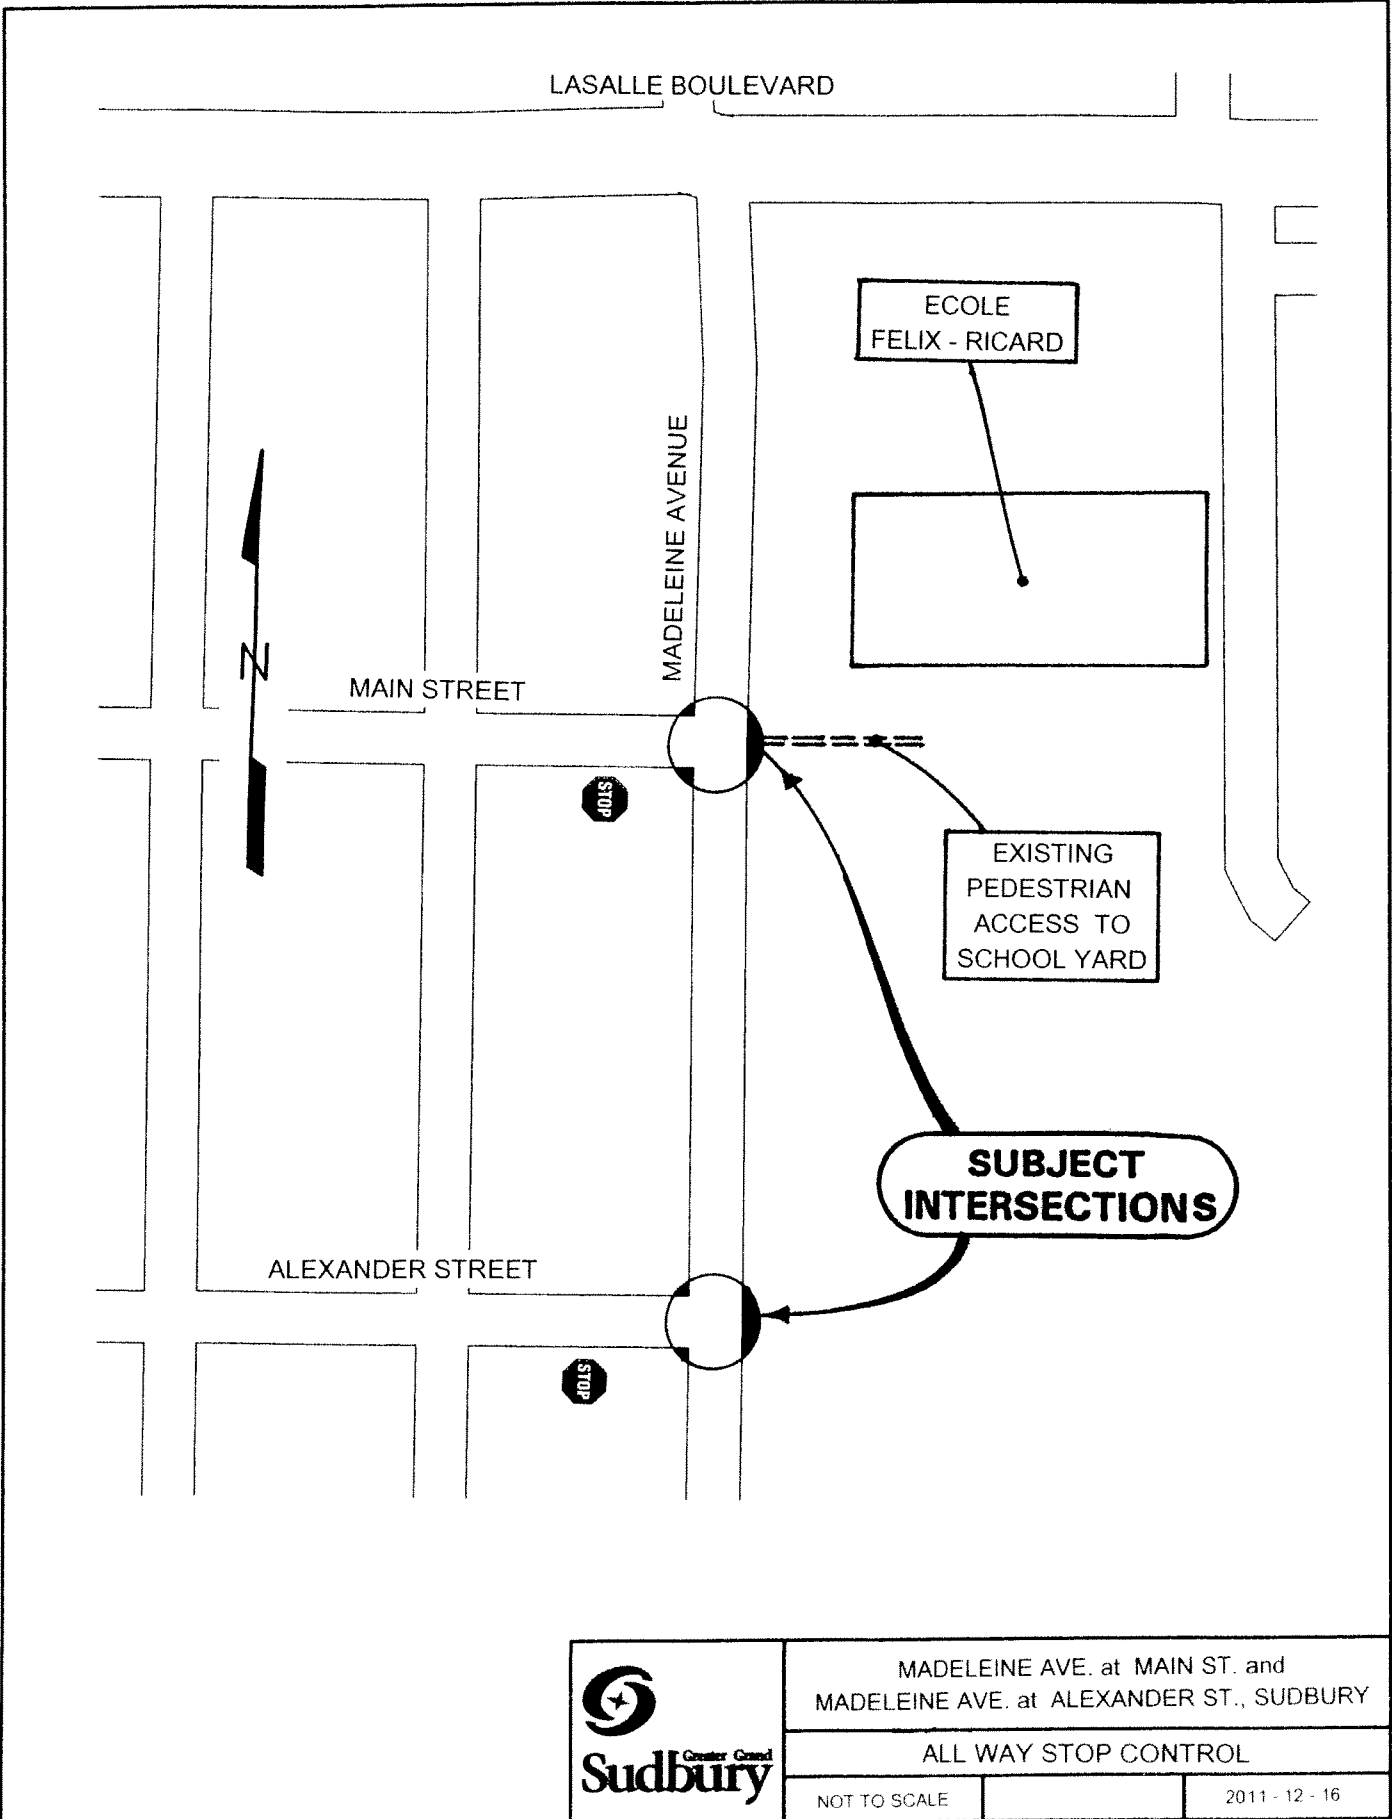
T Intersections Located South of Lasalle Boulevard 1/1
